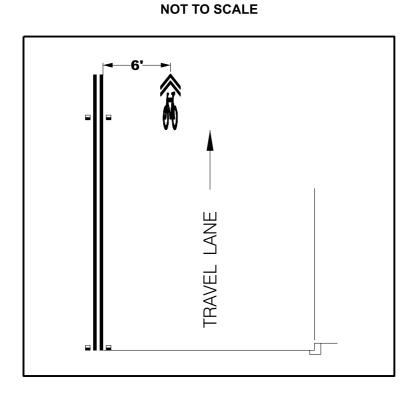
DETAIL "D" - SKIPPED GREEN INTERSECTION EXTENSION
